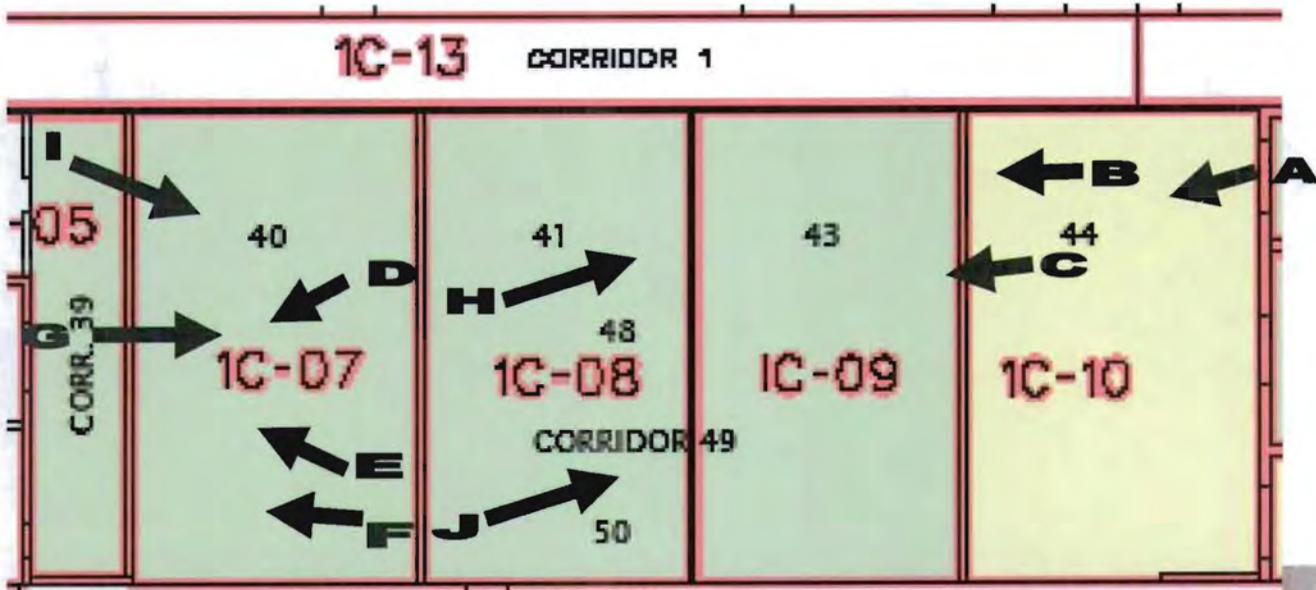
T Bldg. Rooms 39-44, 48-50 View A
